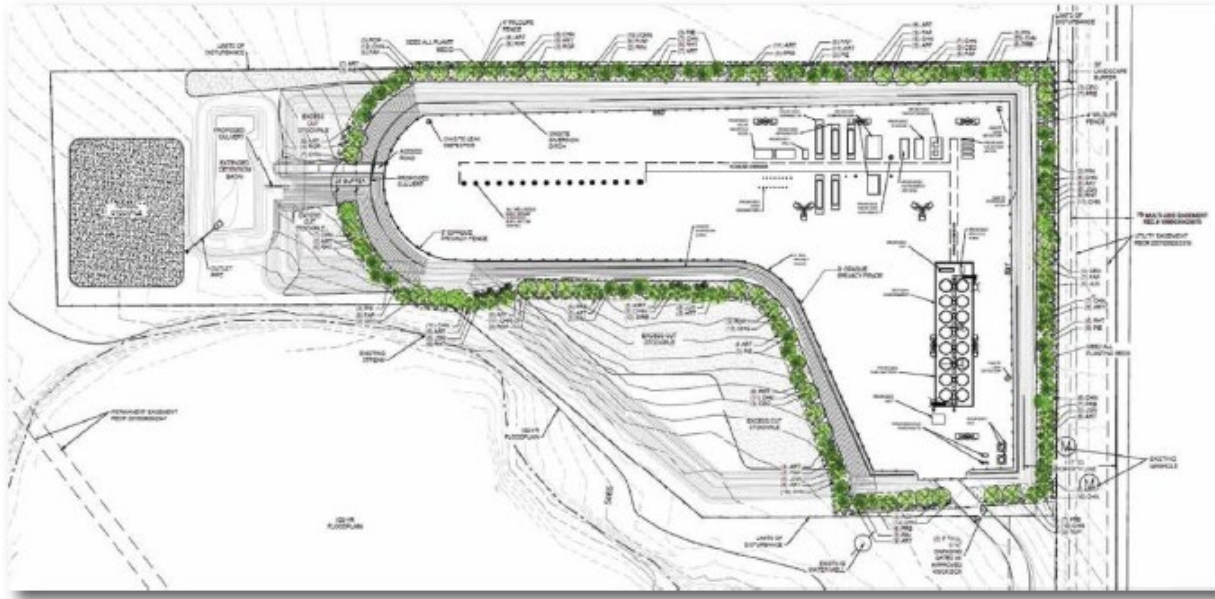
## EXHIBIT B: Location Map with Access Road and Surrounding Roads
